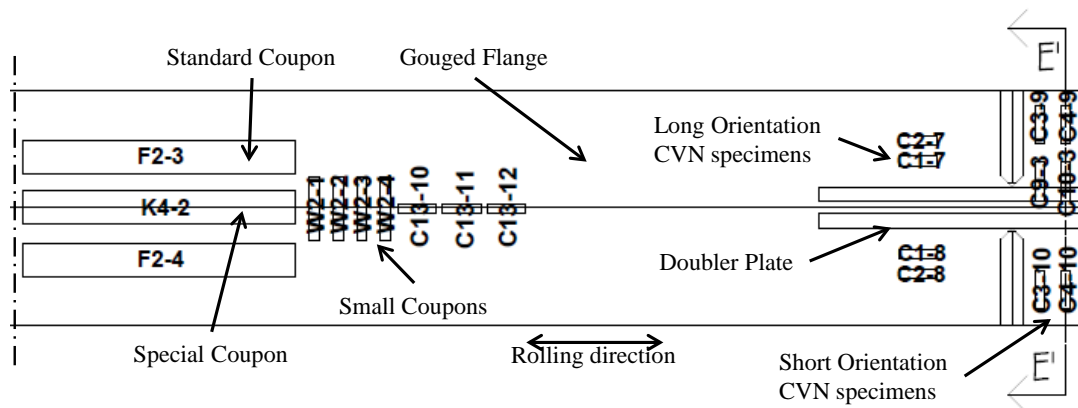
Plan view and cross sections of gouged column flange / web showing locations of CVN specimens
